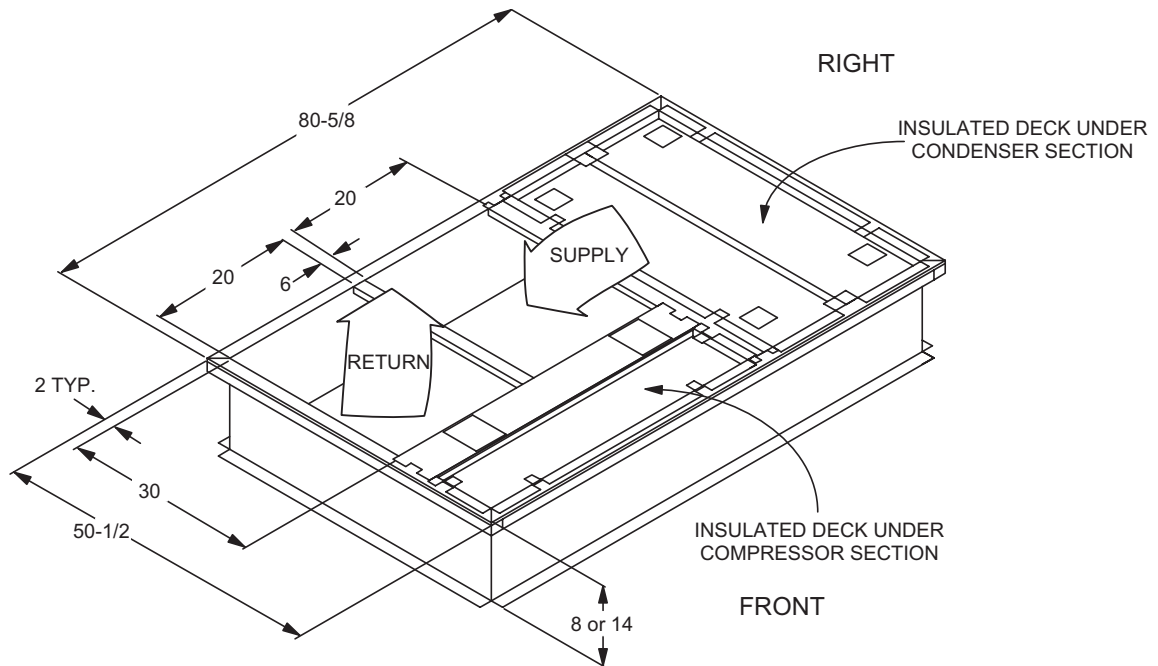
PREDATOR® ROOF CURB DIMENSIONS
